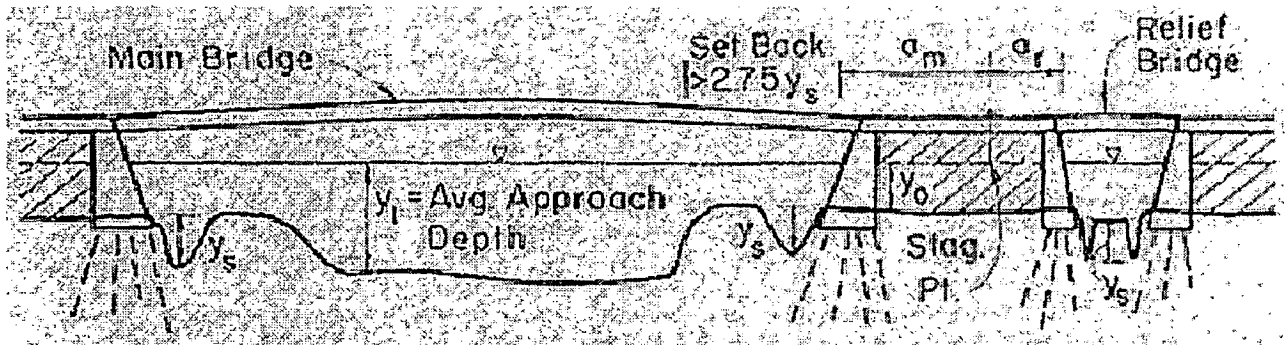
Bridge Abutment Set Back from Main Channel Bank and Relief Bridge
